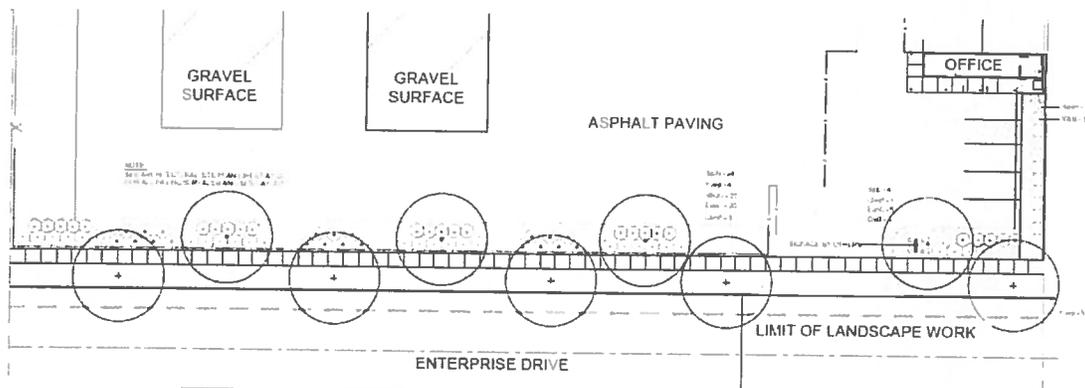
Proposed Street Frontage Landscaping along Enterprise Dr.
